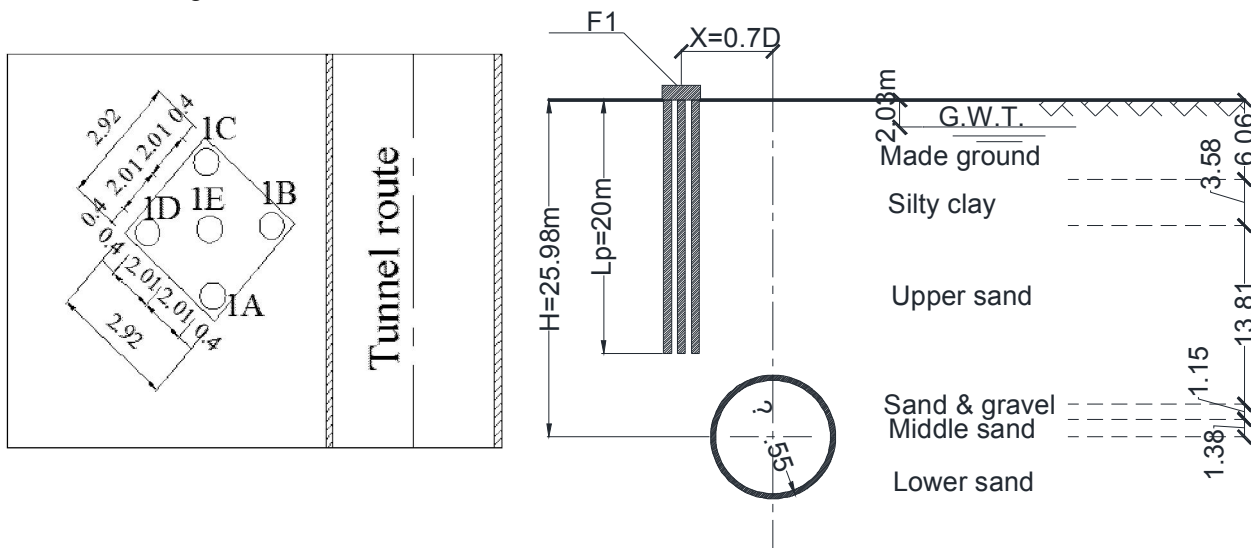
Plan and cross-section views of the closer pilecap (F1) relative to the tunnel route.
